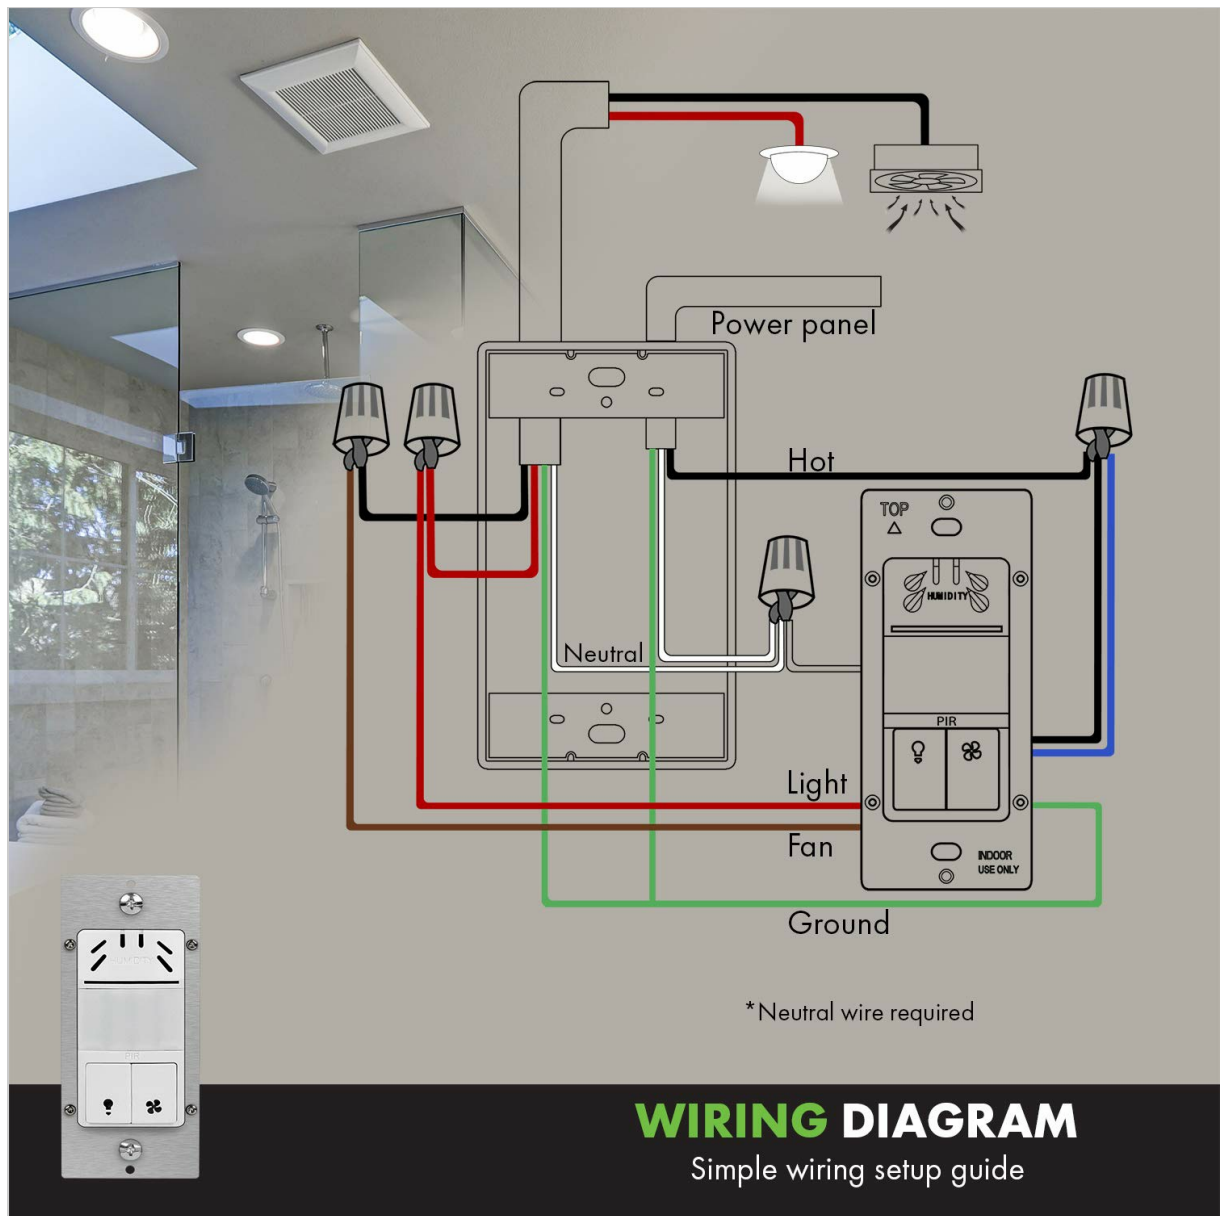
Comprehensive wiring diagram showing the TDHOS5 switch connected to a power panel, light fixture, and exhaust fan within a bathroom setup. A neutral wire is essential for this installation.
